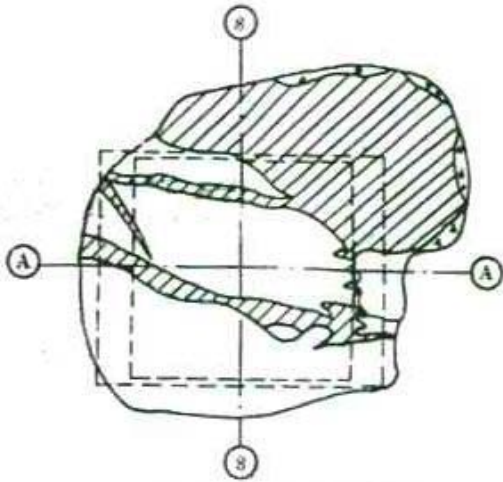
Backfilling PCC under Pile J_{A-8} (hatched areas)
